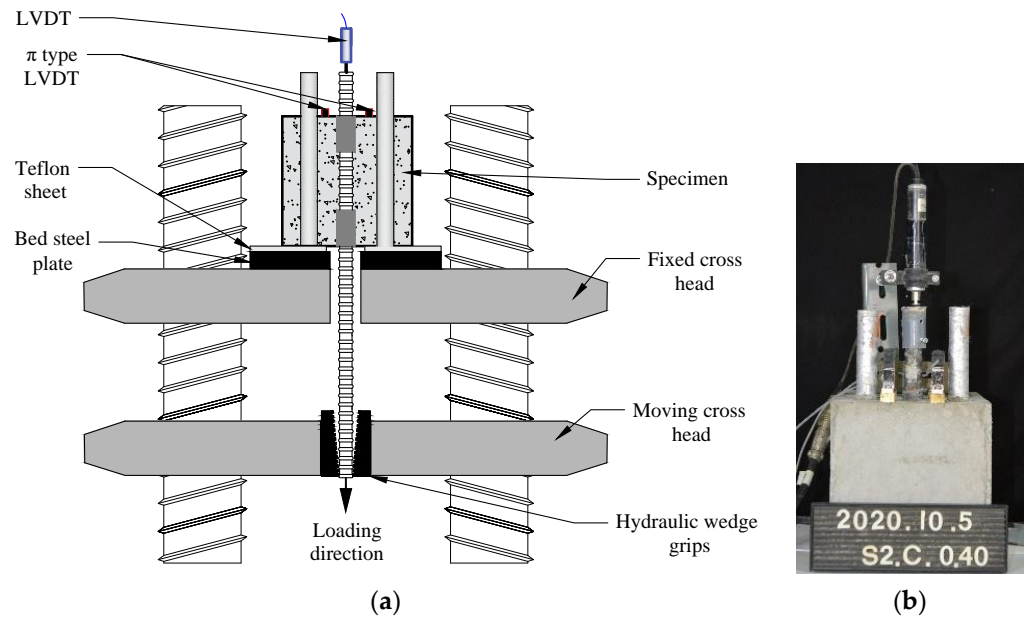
Pull-out setup and measurement method: (a) loading machine; (b) picture of specimen at loading.
